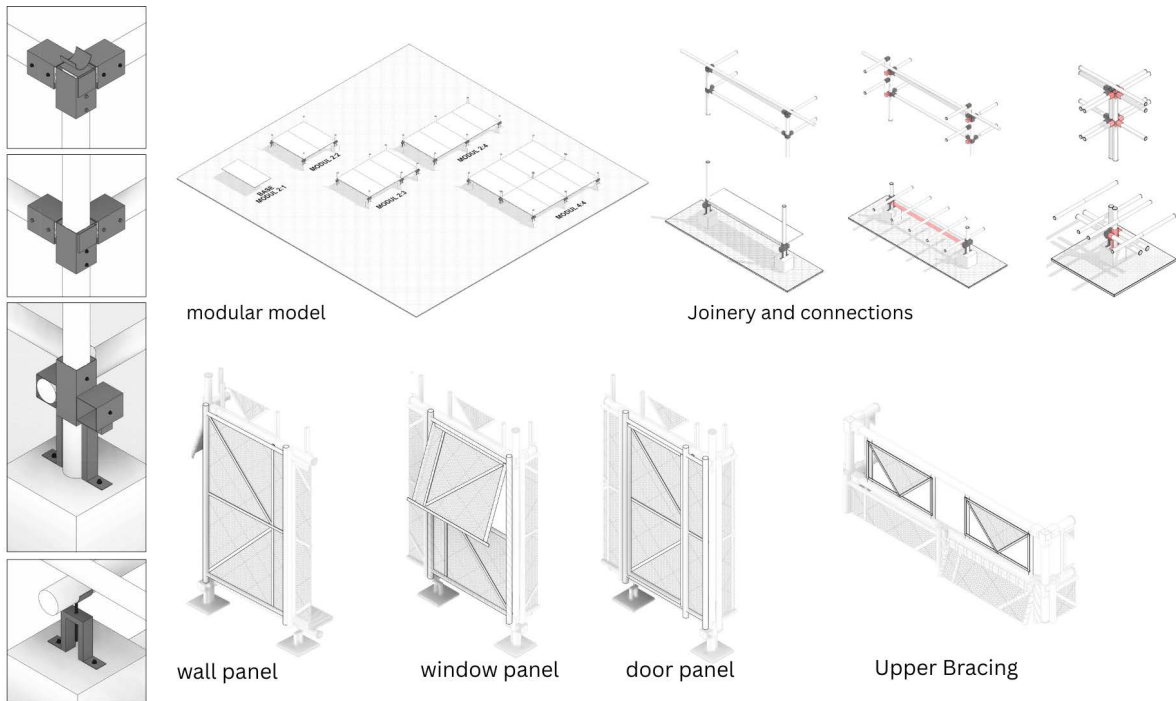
Detailed joinery of the foundation, beam-to-column connection, and roof joint, along with prefabricated wall and roof panels configured using 122 × 244 cm plywood modules
